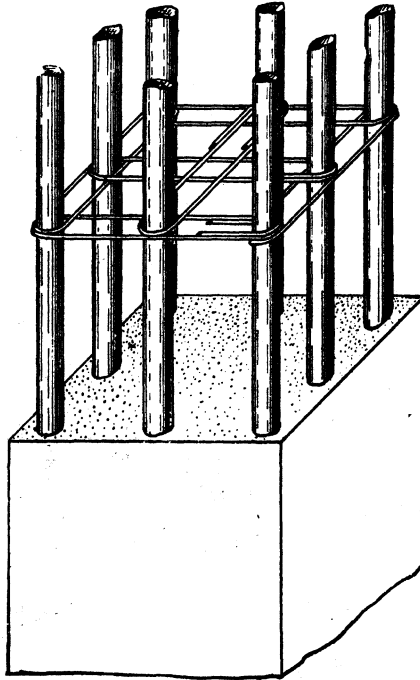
Section of Steel Concrete Column, Hennebique System.
